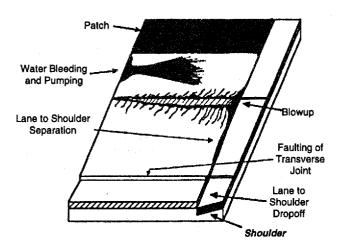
Miscellaneous distresses of jointed concrete pavement
